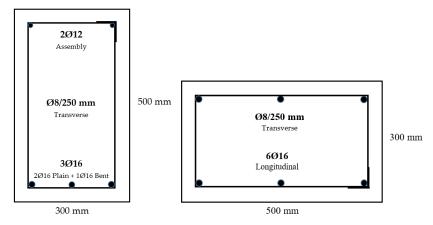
Reinforced concrete sections determined as a result of the scanning application: Column (Left), Beam (Right)
